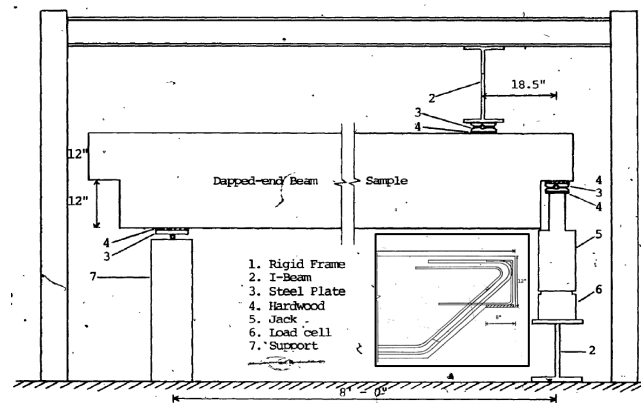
Testing set-up and detail of reinforcement layout of the dapped-beam ends by Liem [8].
